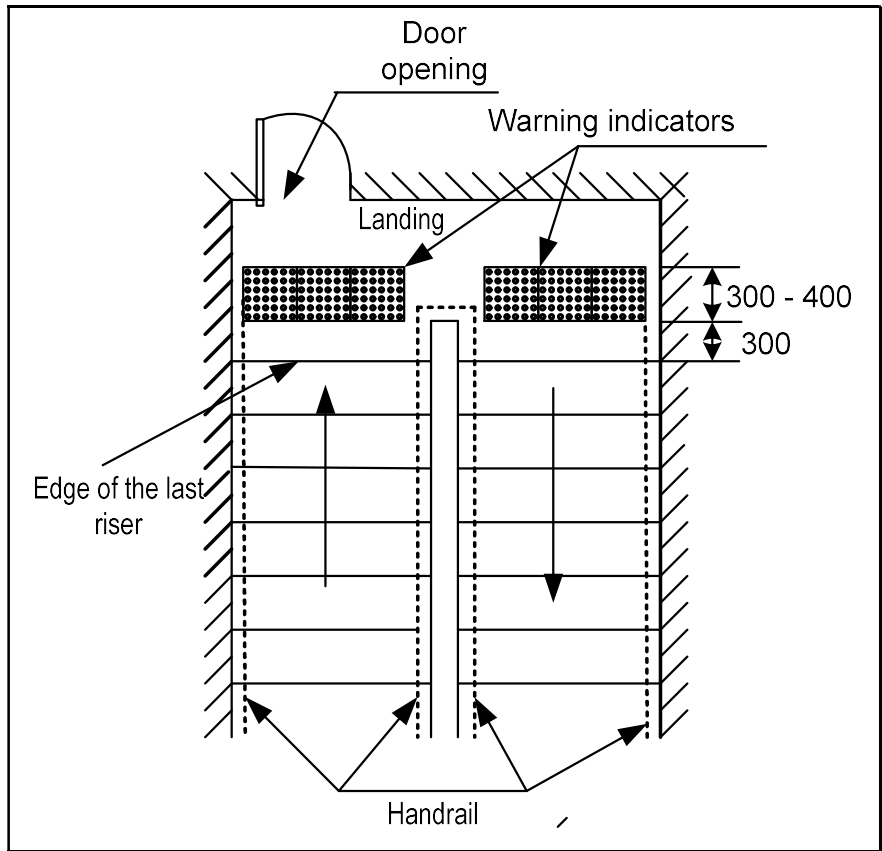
Plan of Installation of Warning TGSIs at a stairway
